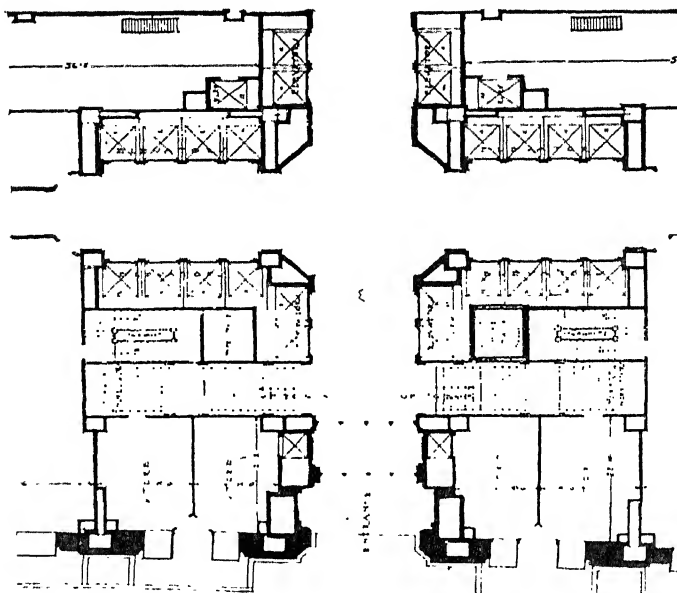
Elevator hall, ground floor, Woolworth Building, New York City, U.S.A.
